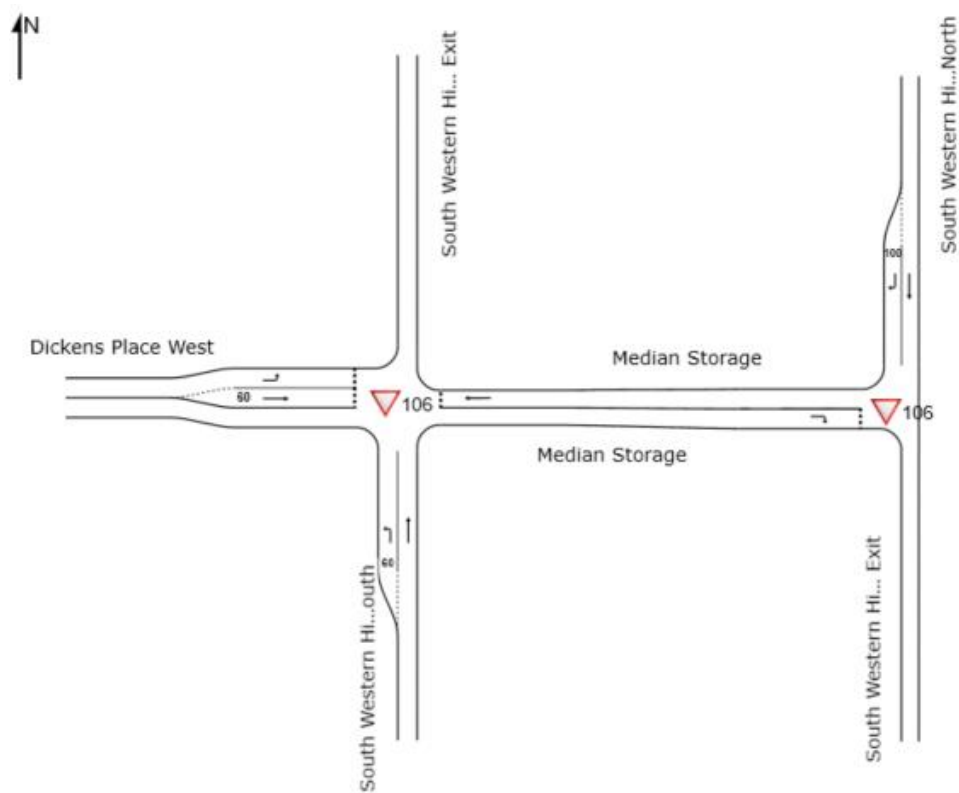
SWH/ Dickens PI – two staged intersection layout – without SWH duplication
